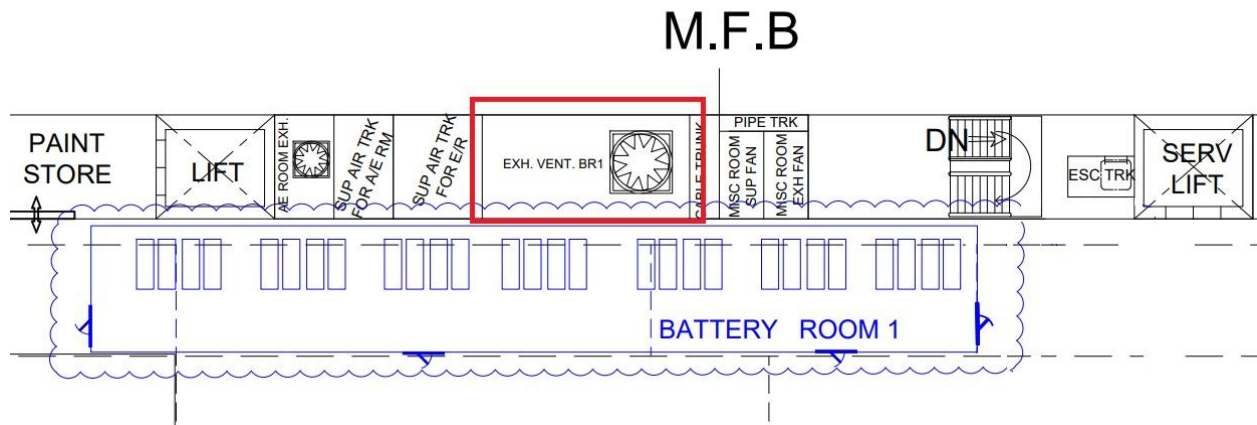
Proposed locations of Exhaust Ventilation System of Battery Room No.1
